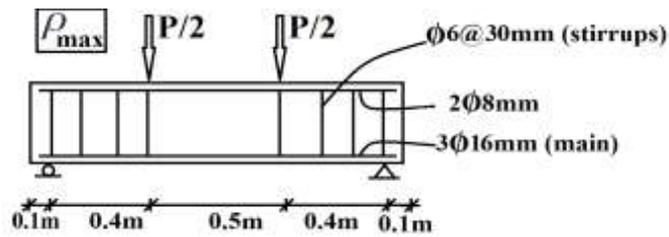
Reinforcement, geometry and loading of the beam 2P-max
